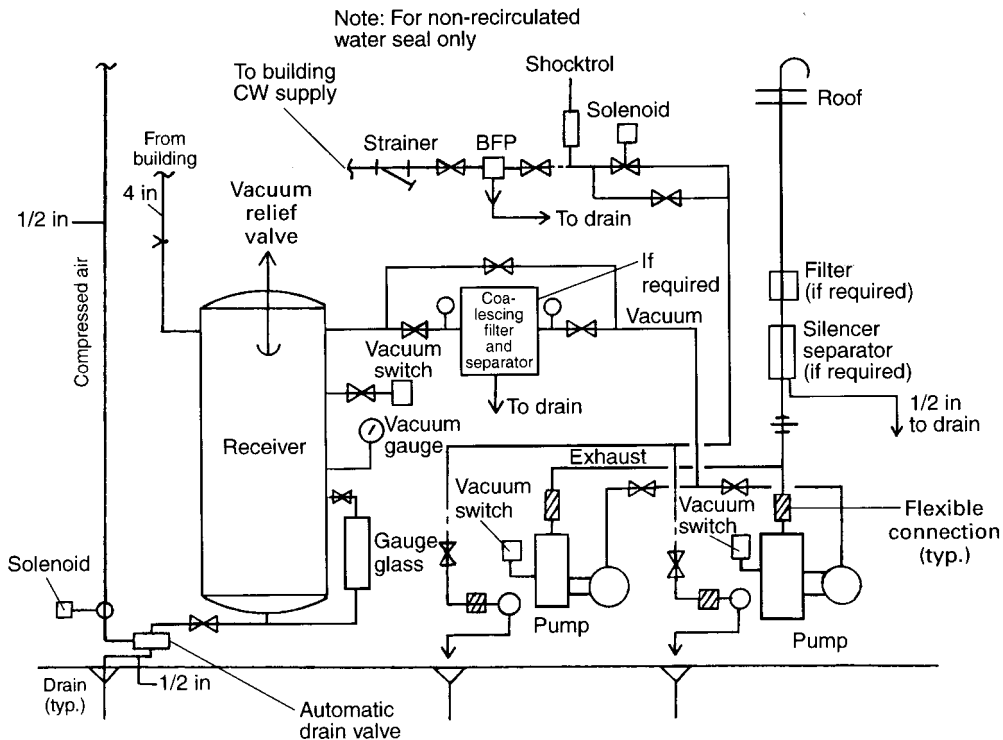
Schematic detail of a typical laboratory vacuum pump assembly.
